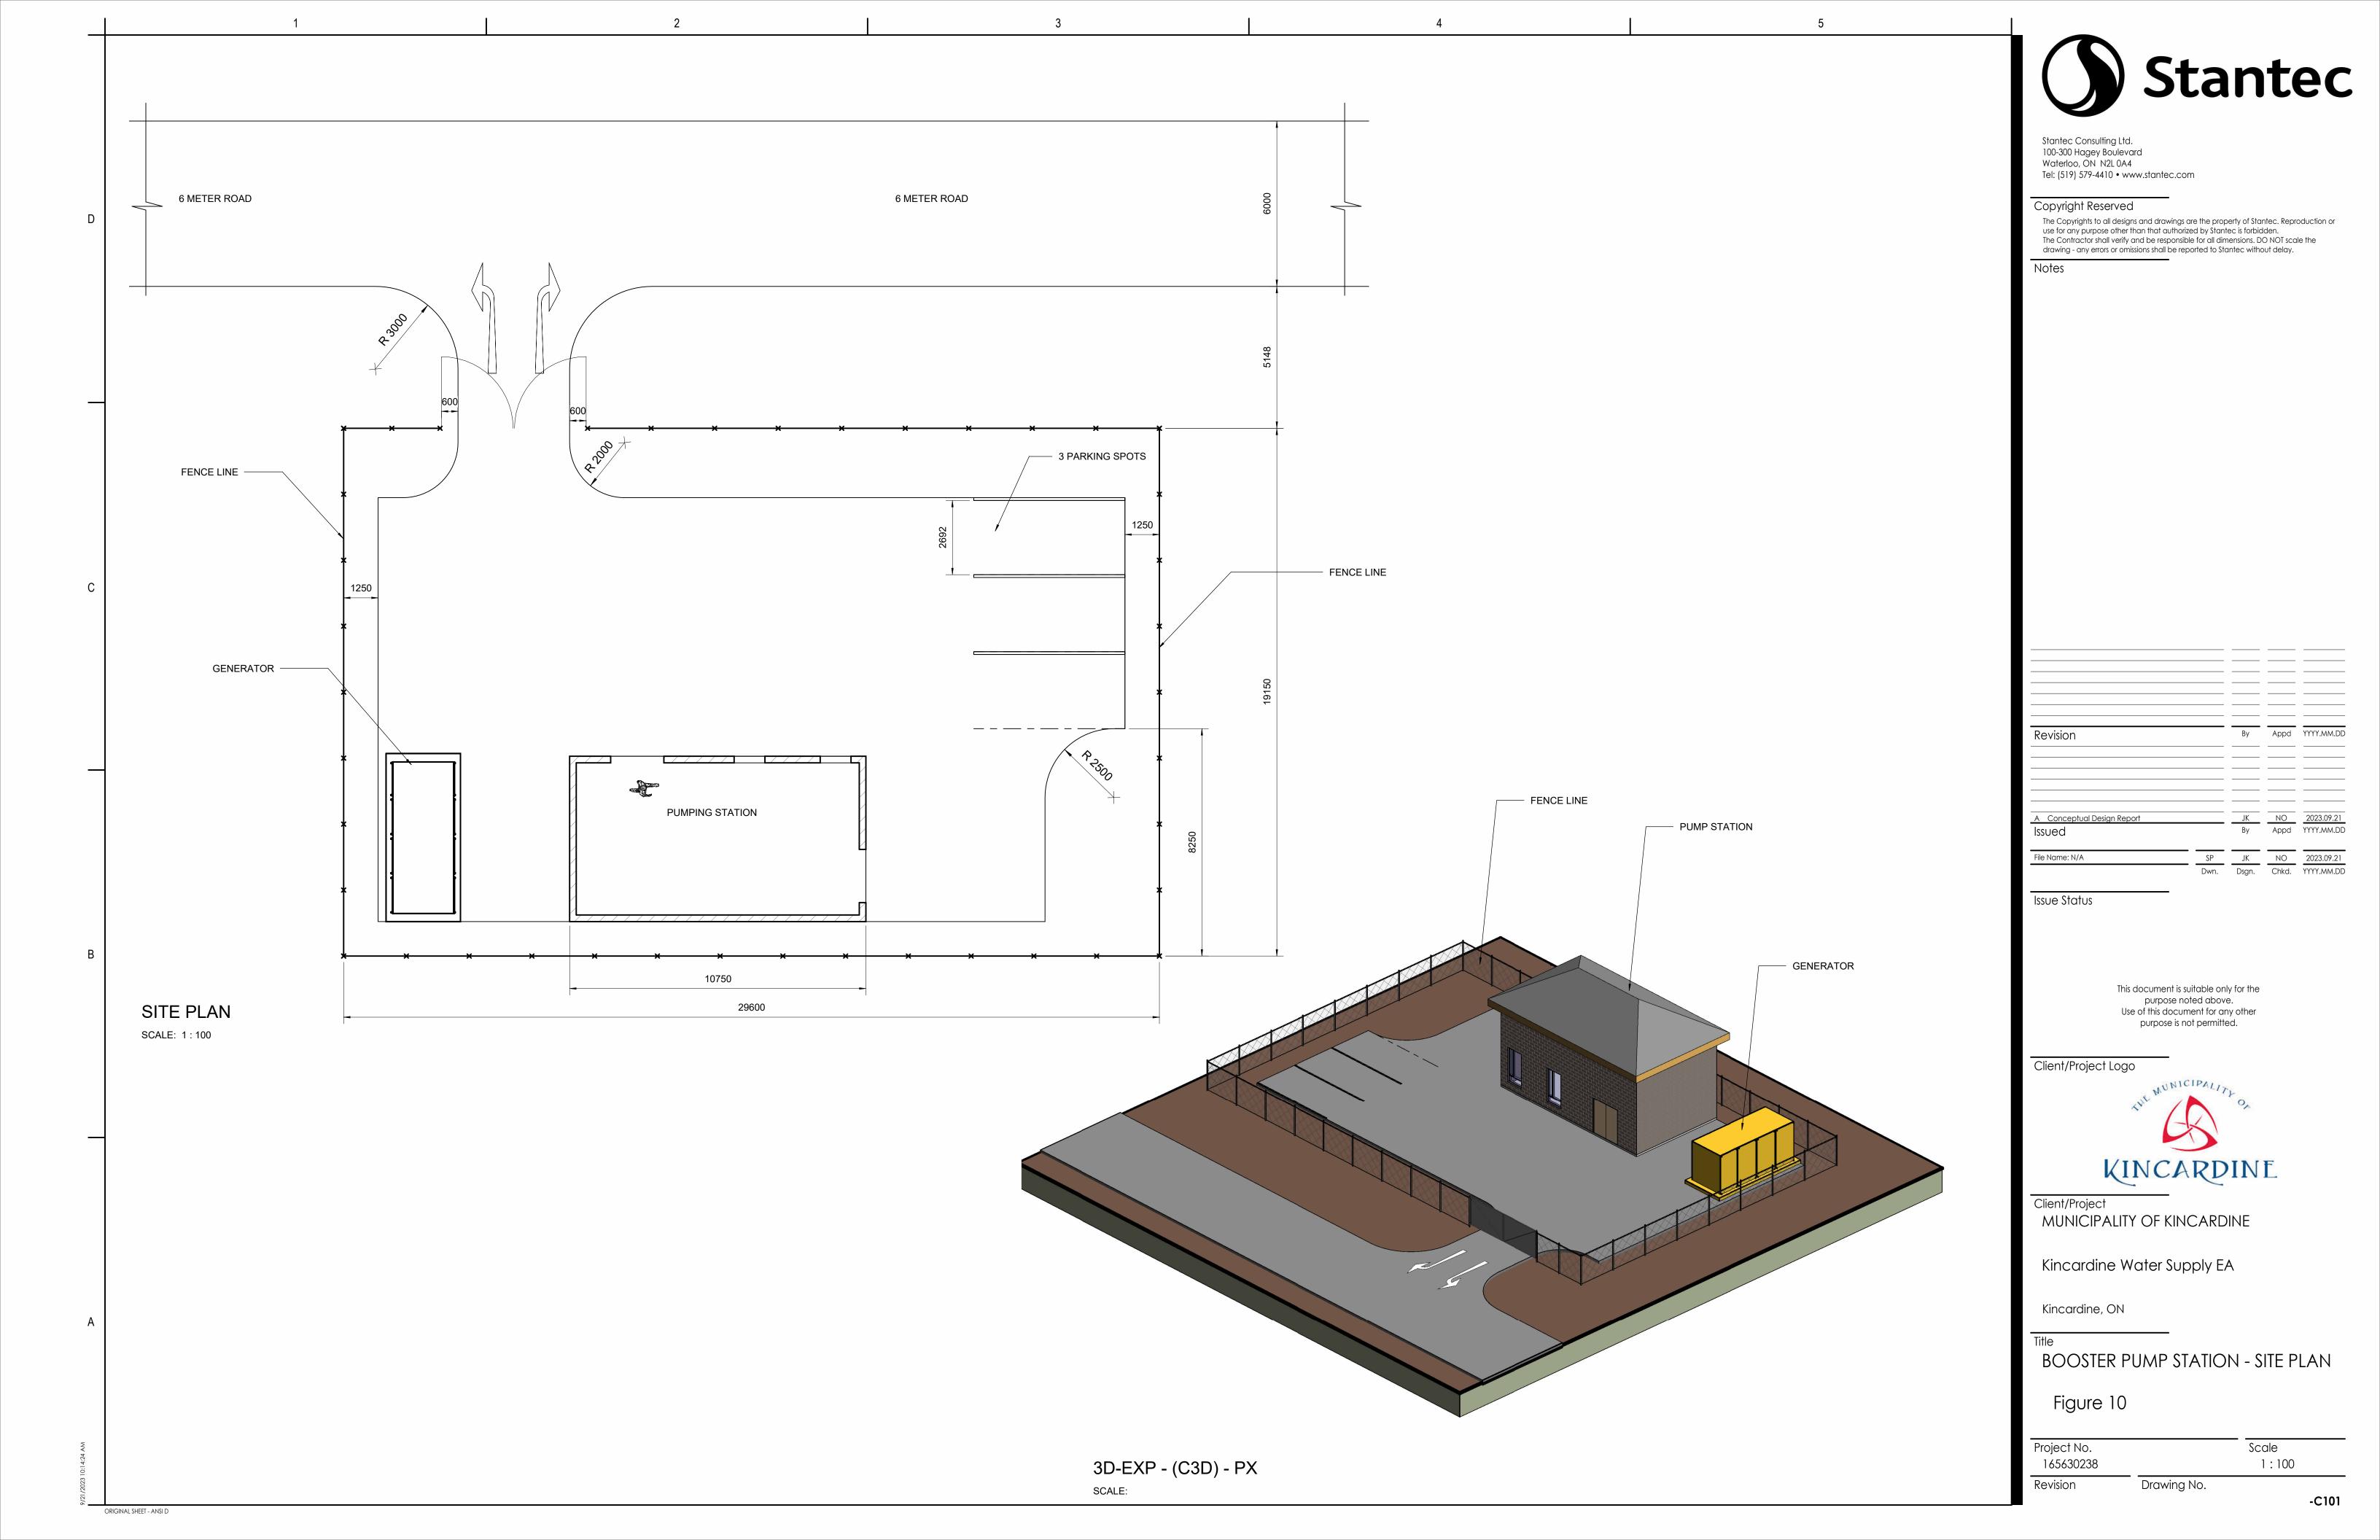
includes the BPS Site Plan Concept, used to determine potential property requirements and preliminary sizing. Details would be refined further in detailed design.
